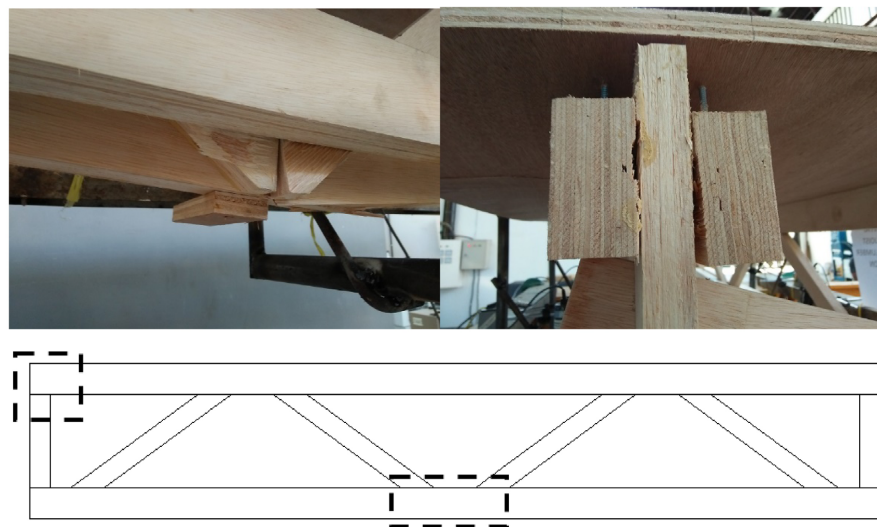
Failure mode of open web truss joist (TJS) specimen.
